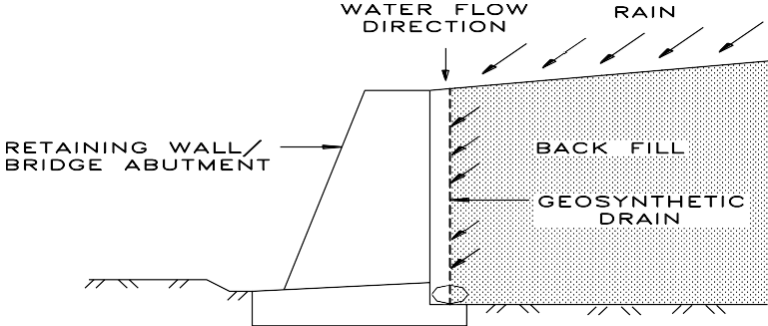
(b): Drainage behind Bridge Abutment/Retaining Wall
